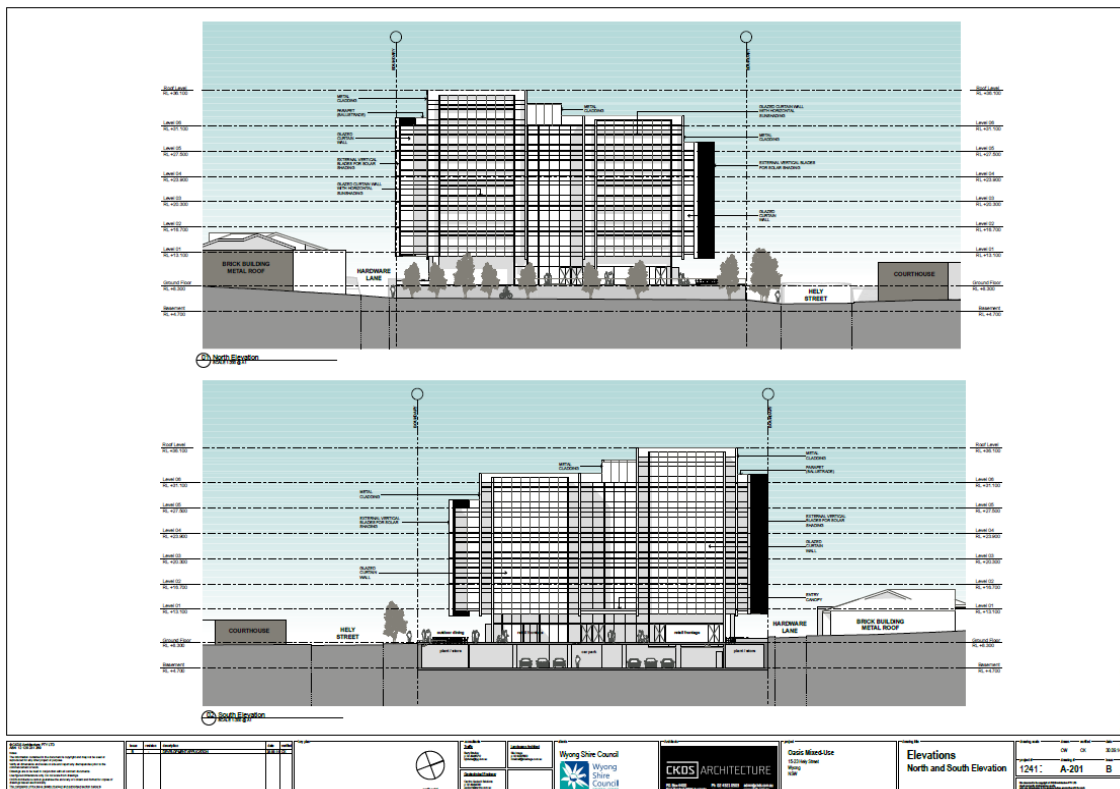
South and north elevations of proposed Stage 1 mixed use commercial and retail development.
